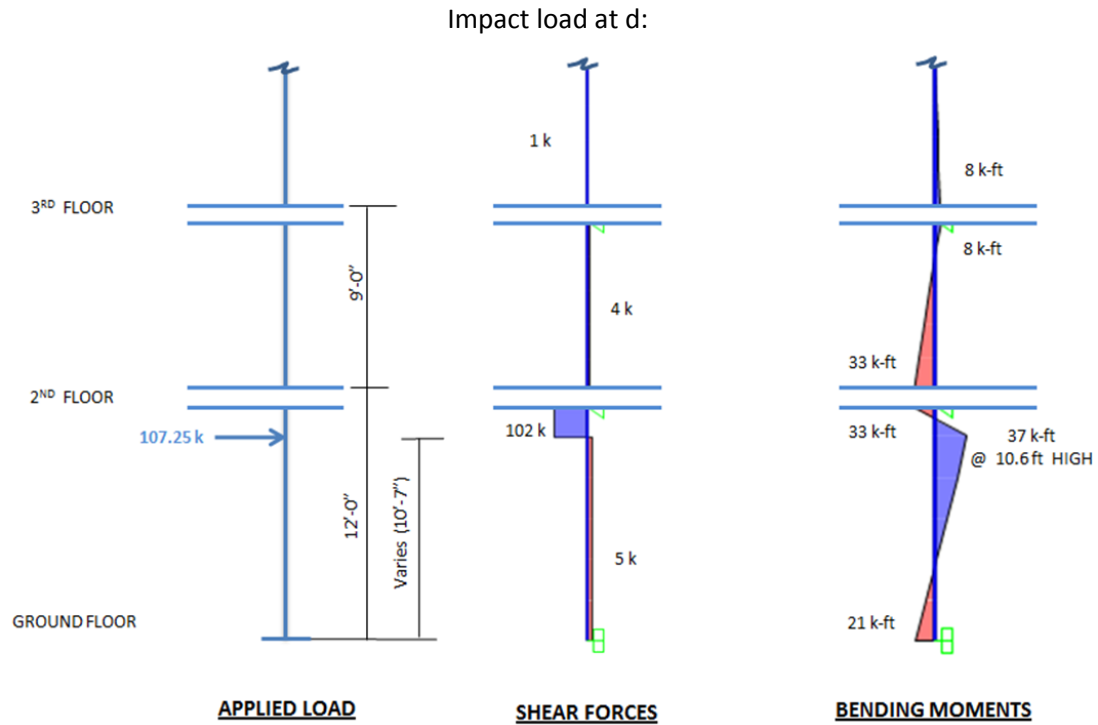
Impact load applied at d away from the end of column on the ground floor
